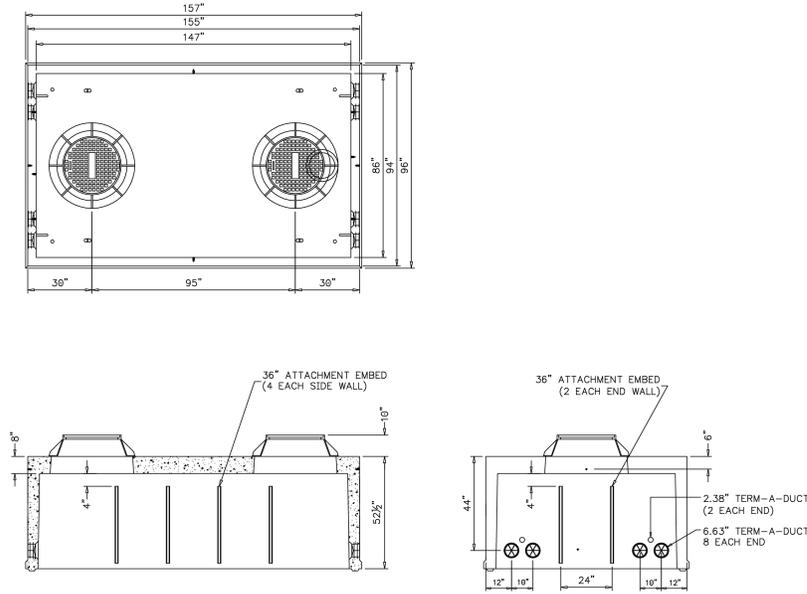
7' × 12' (94" × 155") Manhole Top Layout
